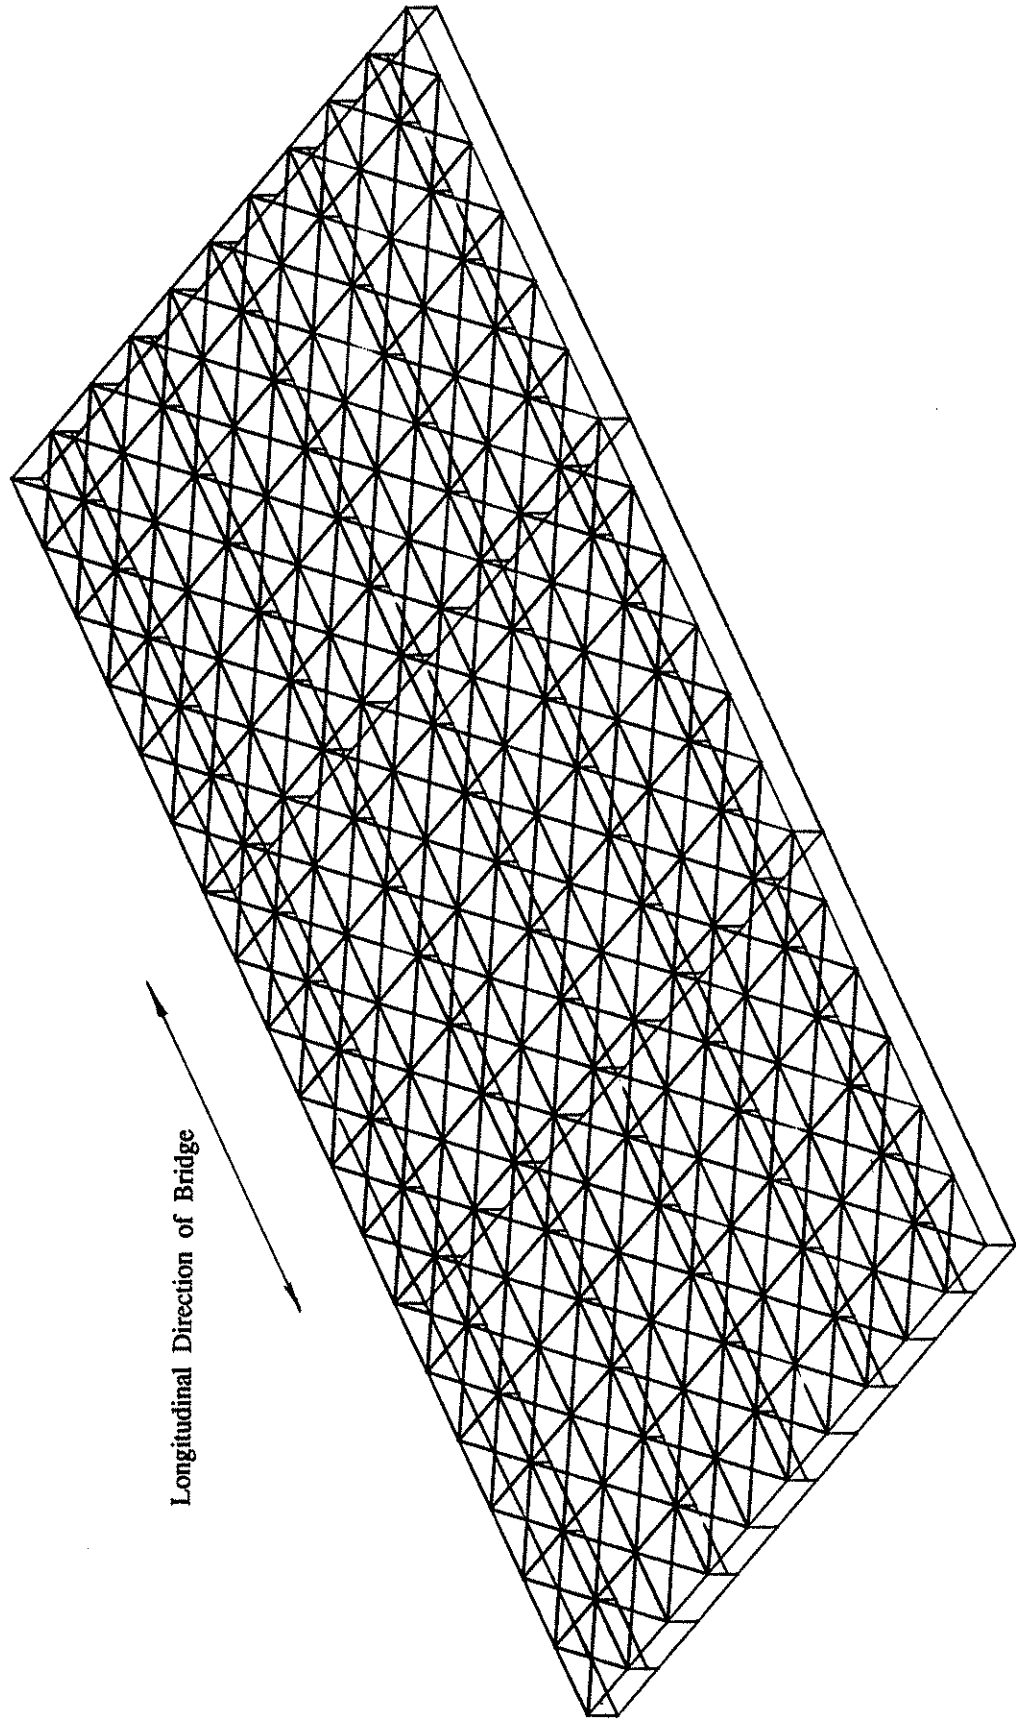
Finite Element Model for Bridge Floor System with Concrete Roadway Deck
